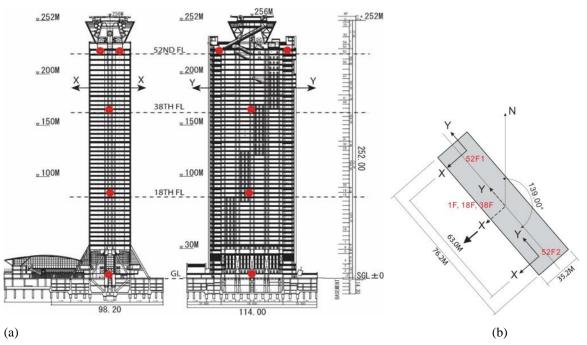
(a) Vertical sections of the building showing major dimensions and locations of tri-axial accelerometers on the 52n, 38th, 18th and ground level (1st Floor). (b) X and Y denote principal axes of the building and orientations of the accelerometers (from Çelebi et al, 2012[4]).
